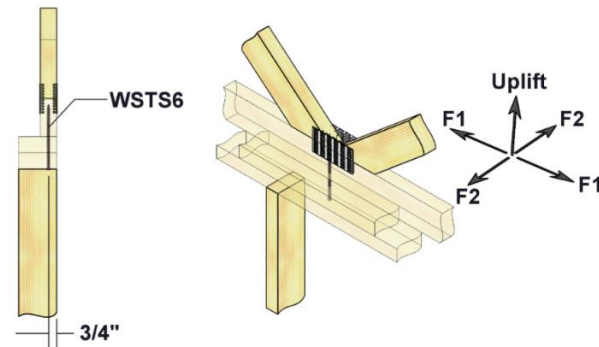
CONNECTION OF DOUBLE TOP PLATES TO END WALL TRUSS WITH WSTS SCREWS
